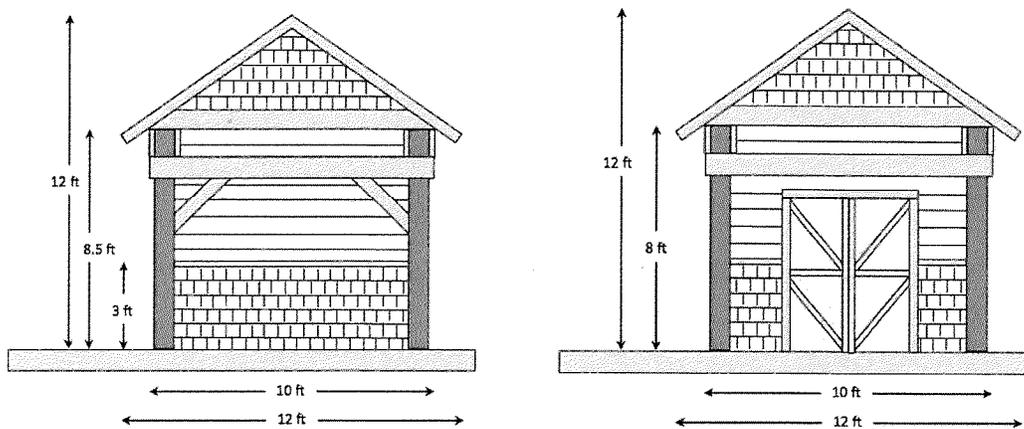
Elevation drawings to scale. Left: View from west (28th Street). Right: View from east (yard).
